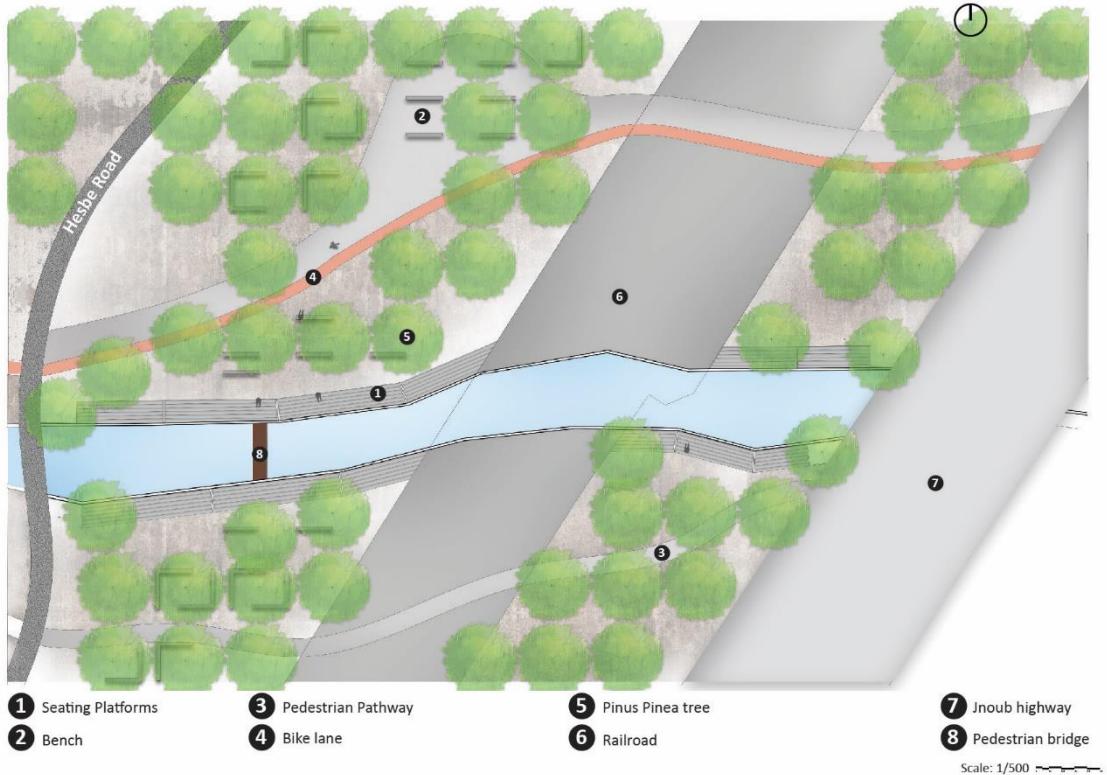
Railroad Garden, Site 4, Plan. Source: Author
